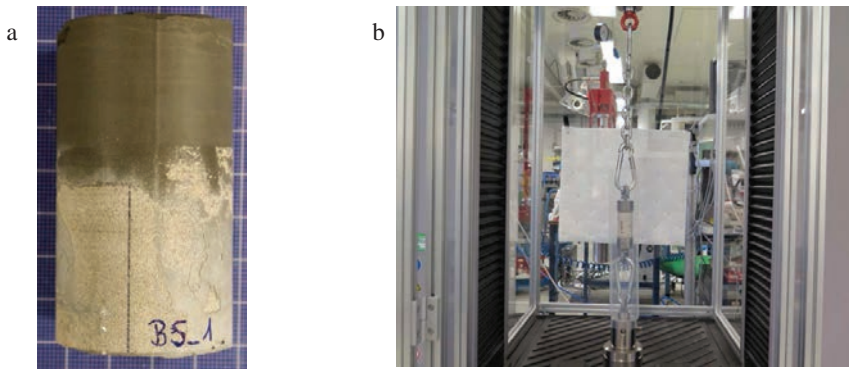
(a) Composite plug with interface perpendicularly oriented to the plug axis; (b) uniaxial load frame set-up for direct tensile strength testing.
